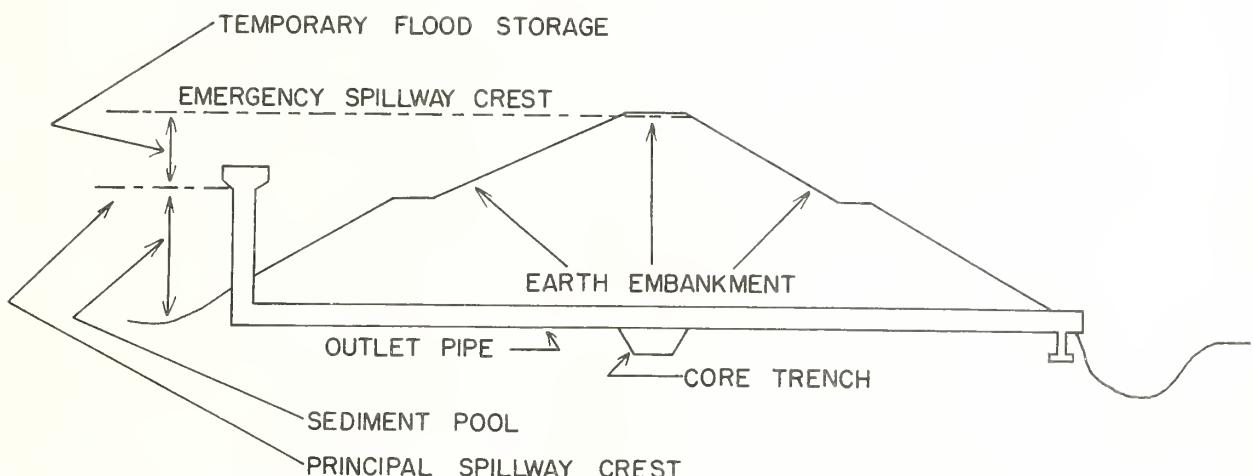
Cross section of typical floodwater-retarding structure.
